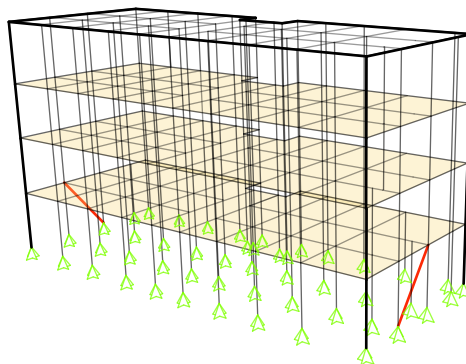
Retrofit 1: 10% Damping via Viscous Dampers.
